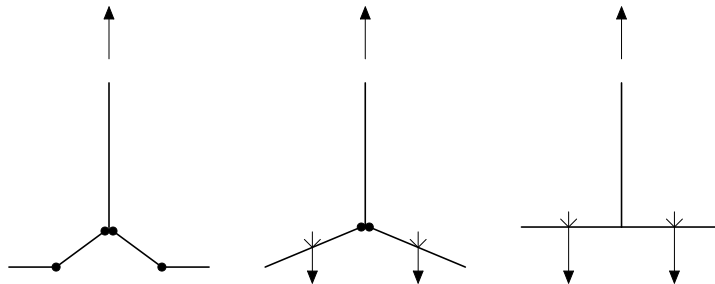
Failure mechanisms for T-stub model used in Eurocode [3]. Yielding of plate (left), bolt failure and yielding of plate (middle) and bolt failure (right)
